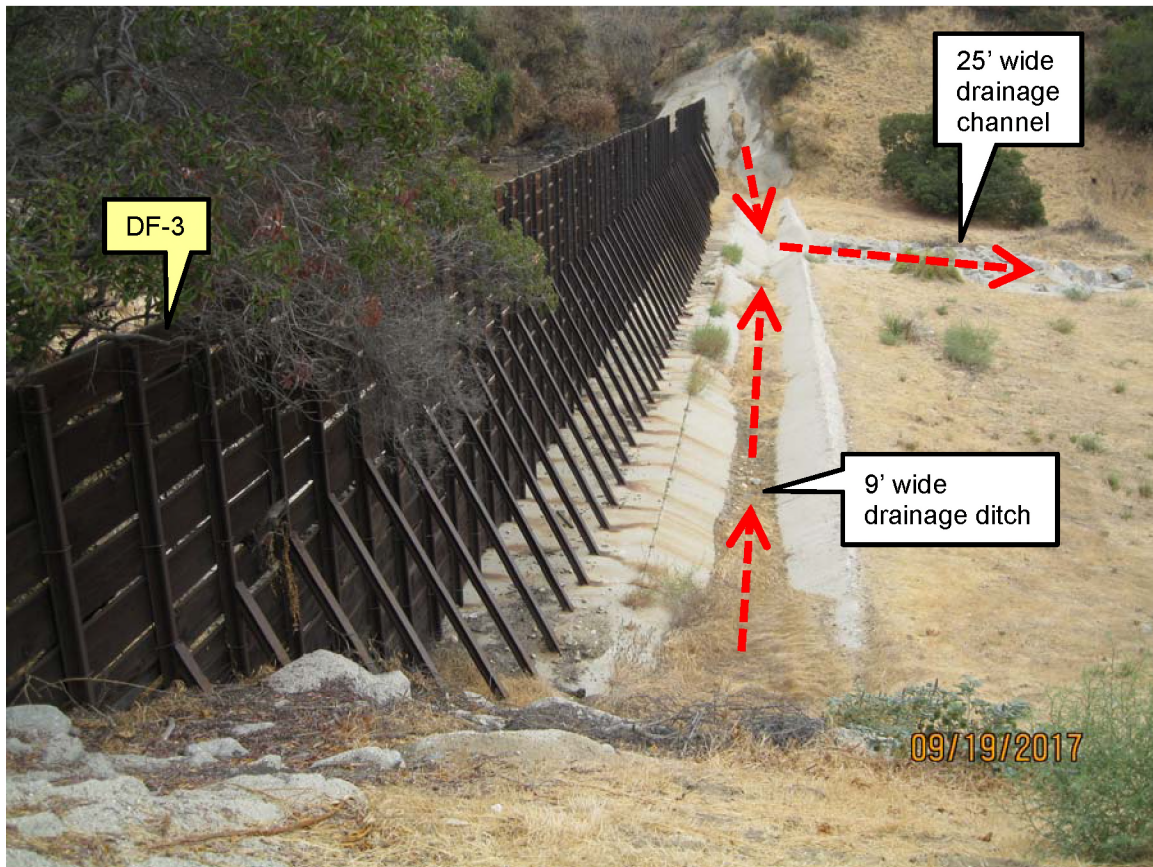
Standing downstream and looking toward DF-3 and the 9-foot wide PCC drainage ditch that is partially filled with sediment. Also note the 25-foot wide drainage channel. The red arrows indicate direction of stormwater flow.
